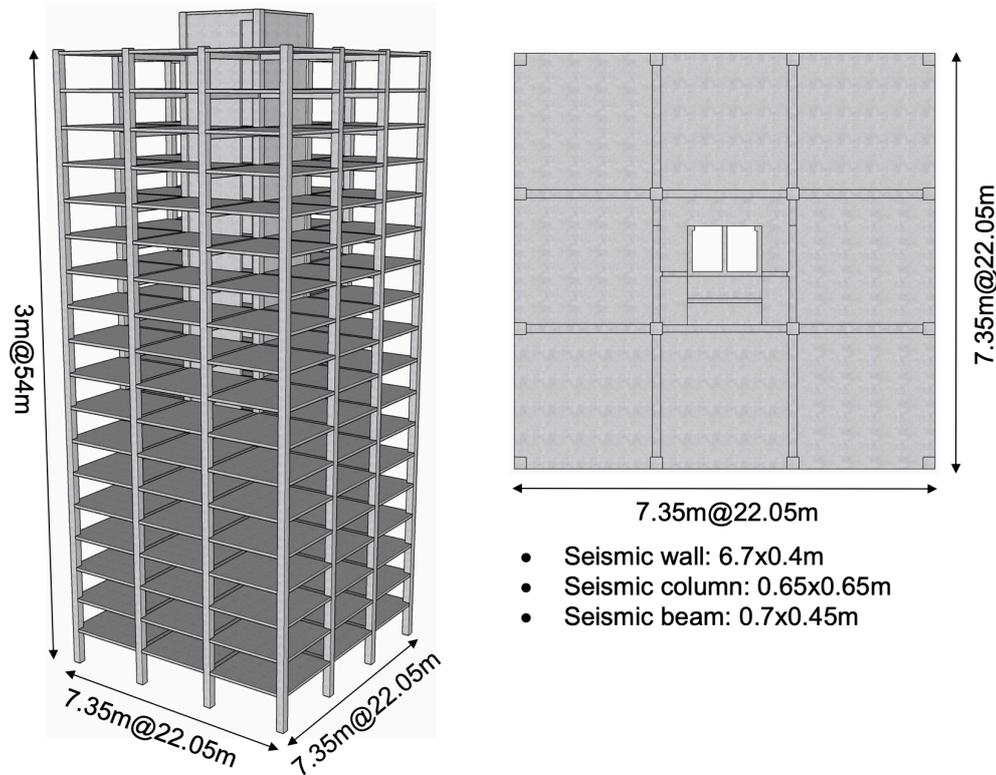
Left: 3D render of the case study building; Right: typical floor and dimensions of the structural elements.
